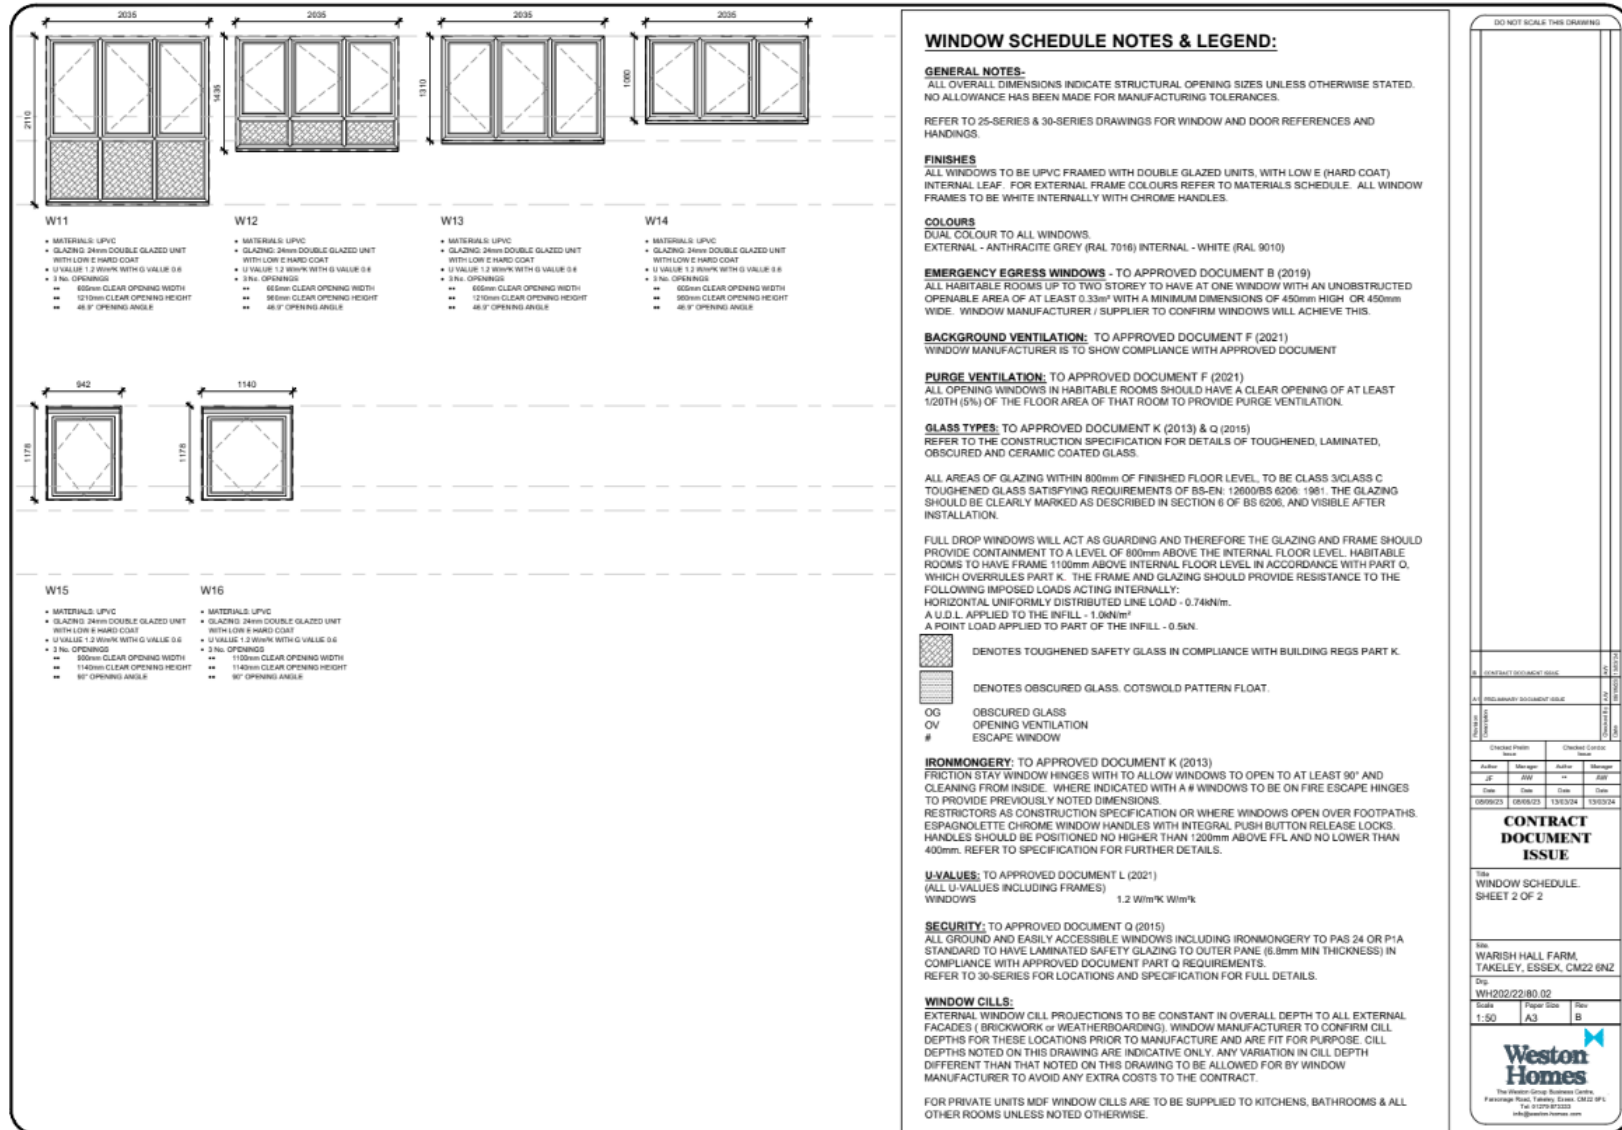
Glazing Drawing WH202/22/80.02 – Jacks Lane
